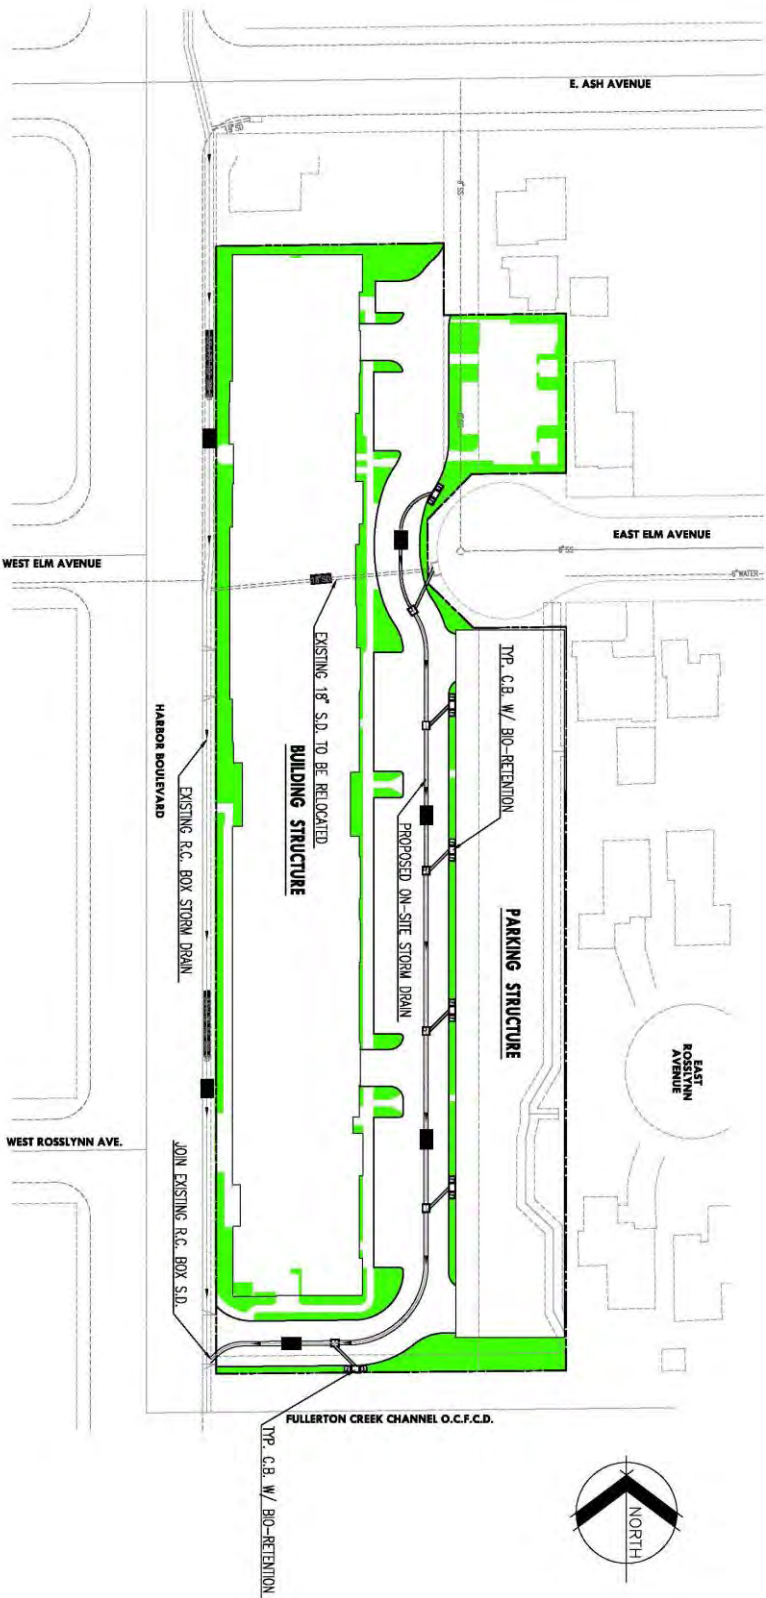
CONCEPTUAL DRAINAGE PLAN
